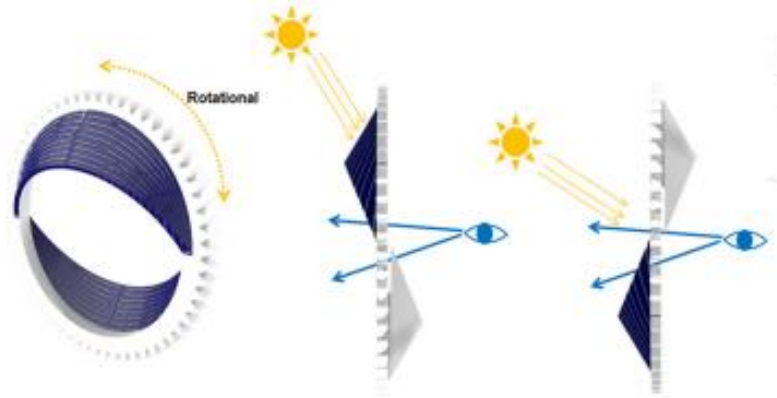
Proposed BIPV curtain wall for building retrofitting application which offers a good view out
